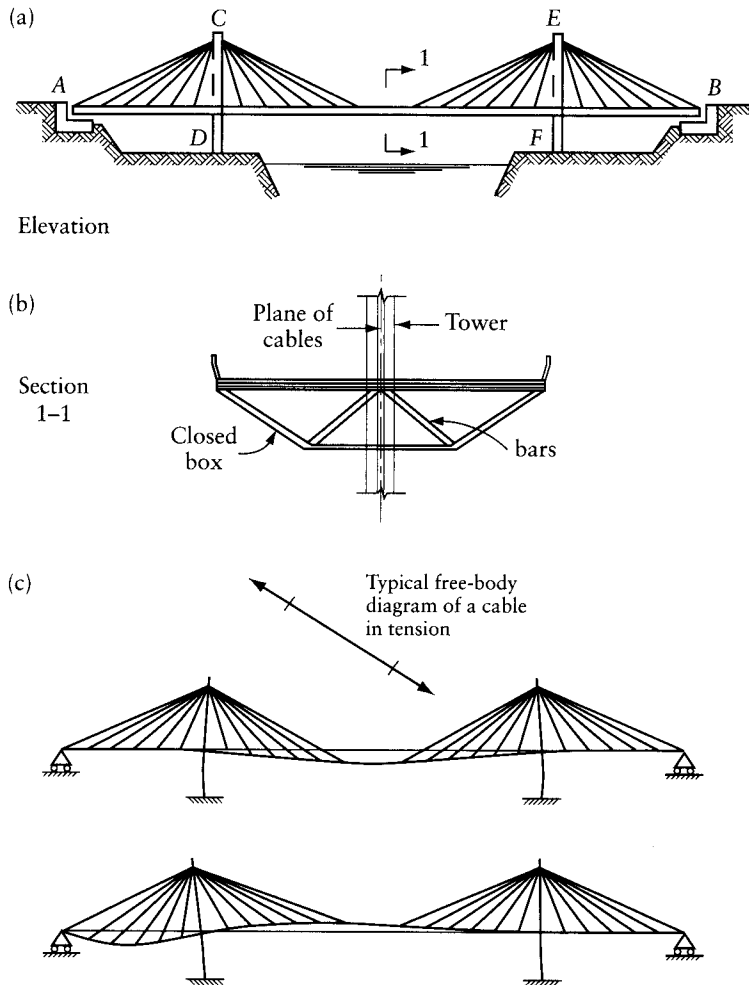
Behavior of a cable-stayed bridge. (a) and (b) Elevation of plane frame idealization and bridge cross section. (c) Deflected shape and forces in cables due to traffic load on interior or exterior span.
